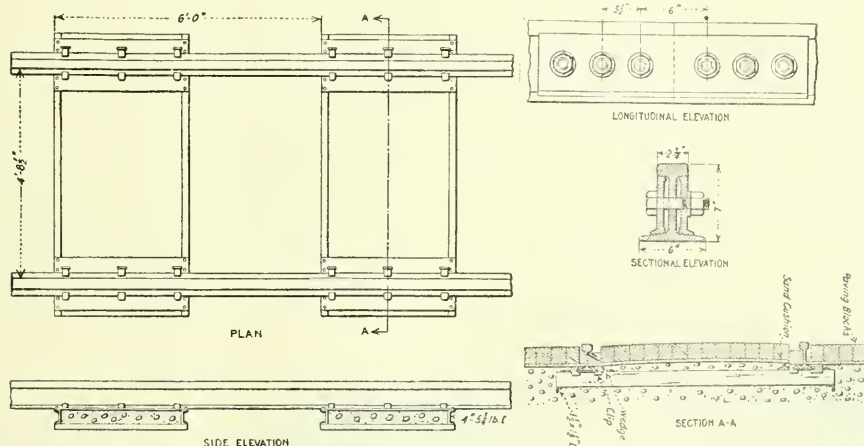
Track Construction and Maintenance—Sections and plan of city T-rail construction; also details of joint.
